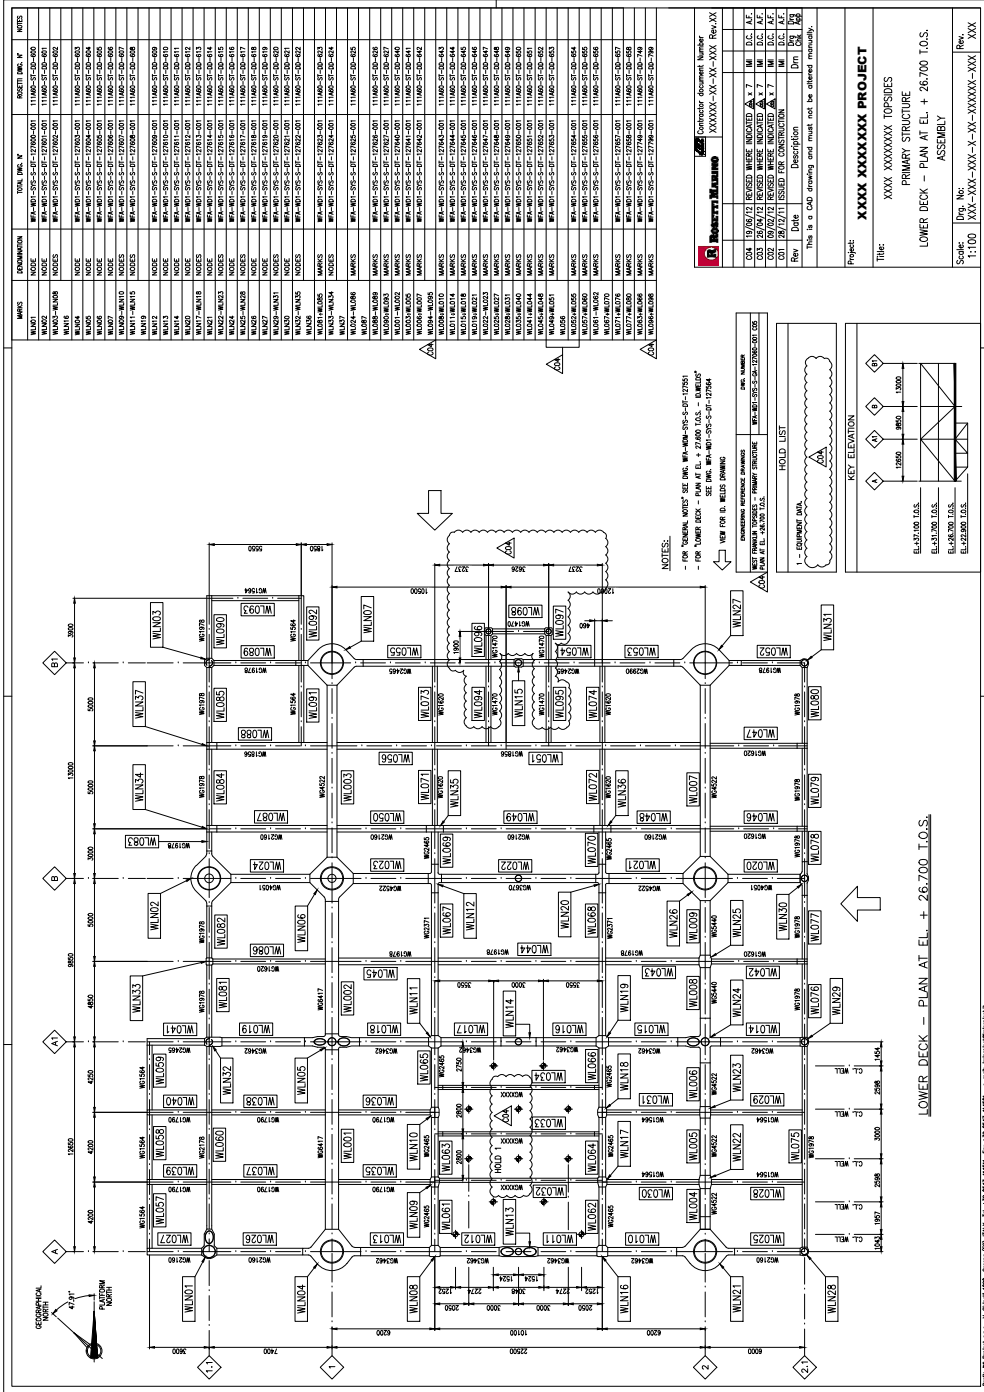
Lower level deck - Shop drawing - Plan view - Primary structure
